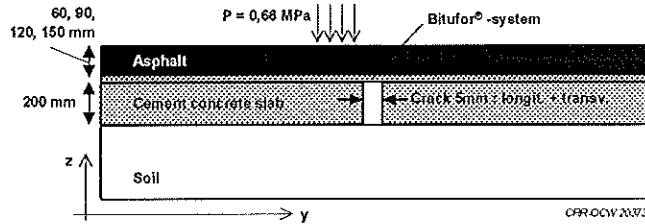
Overview of the road structures considered for the simulation of overlays on cement concrete slabs (traffic).
